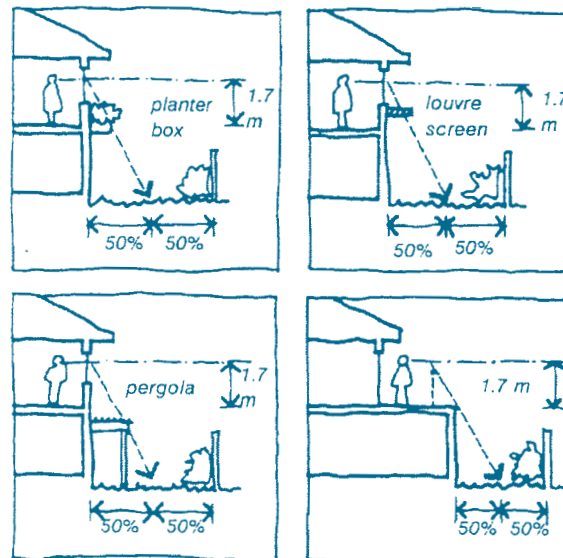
Techniques for providing privacy to a lower dwelling's private open space.
